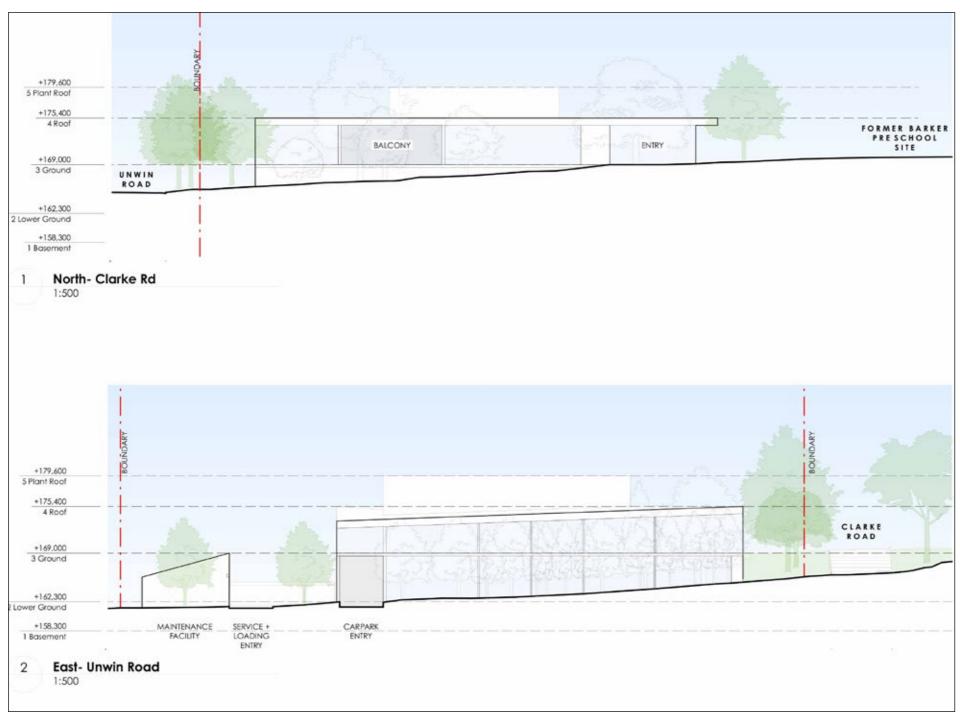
CO-CURRICULAR PERFORMING ARTS AND EXAM CENTRE NORTH AND EAST ELEVATIONS (NEESON MURCUTT + NEILLE ARCHITECTS MAY 2022)
